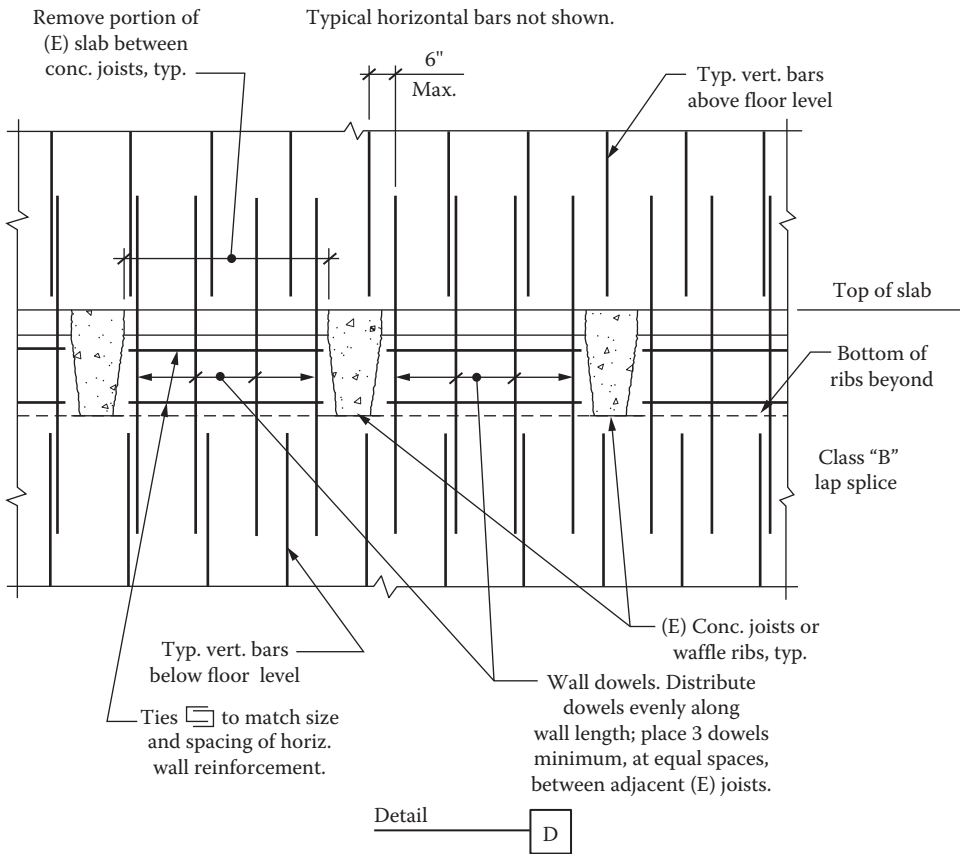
Concrete wall connection to waffle slab—partial elevation view.
